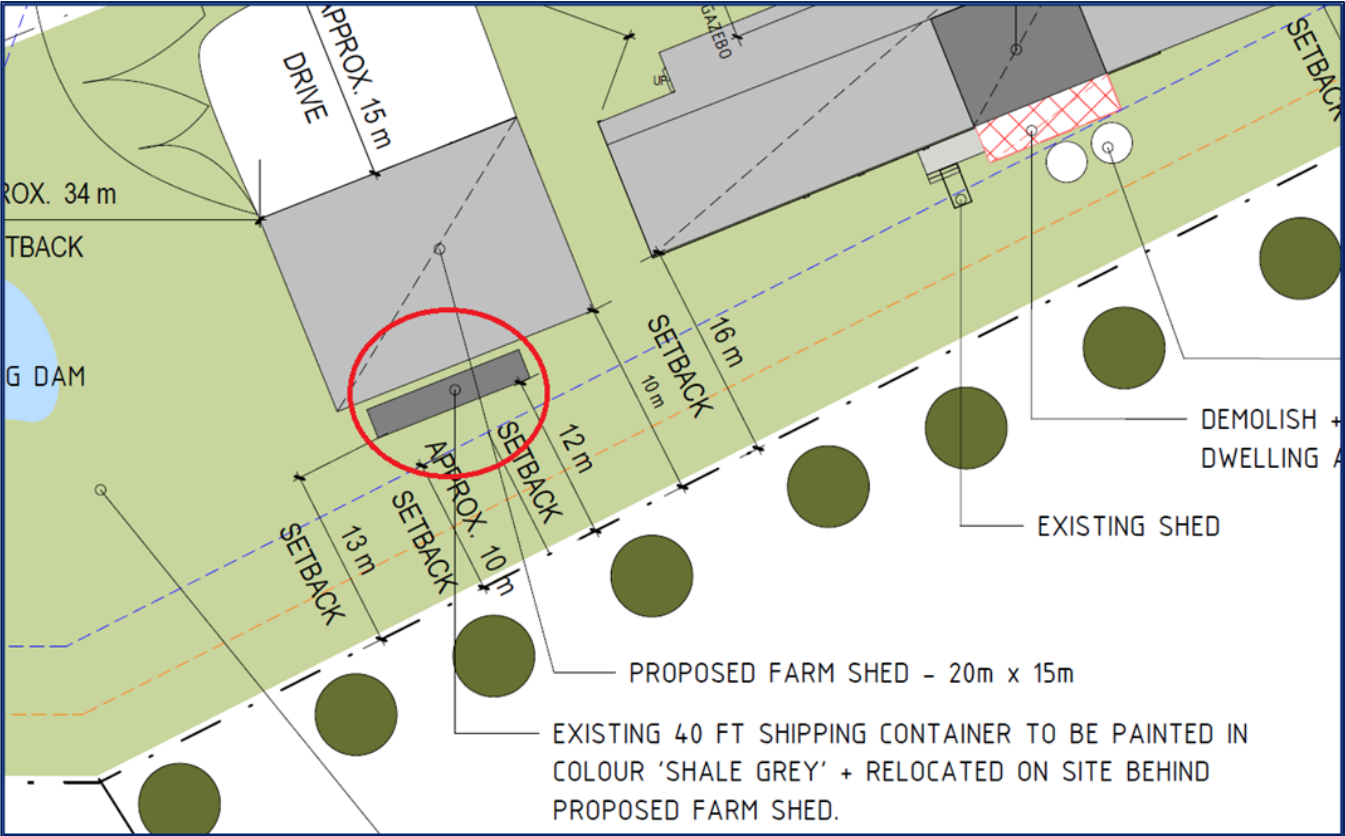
Partial Site Plan showing proposed location of Shipping Container
